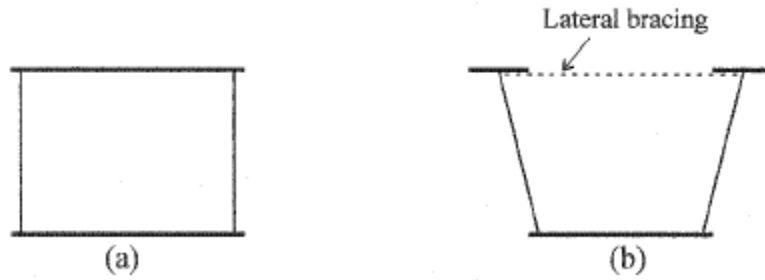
Steel box girders: (a) Enclosed box girder; (b) Tub girder with lateral bracing
